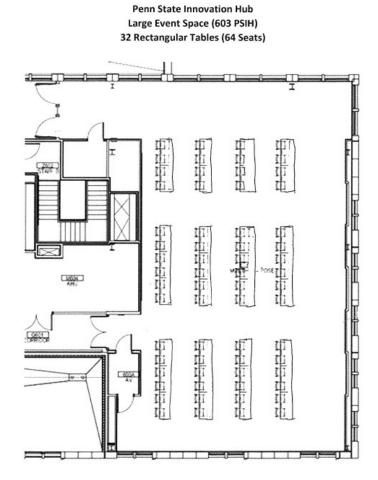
Eric J. Barron Innovation Hub Room 603-Tabled Layout
